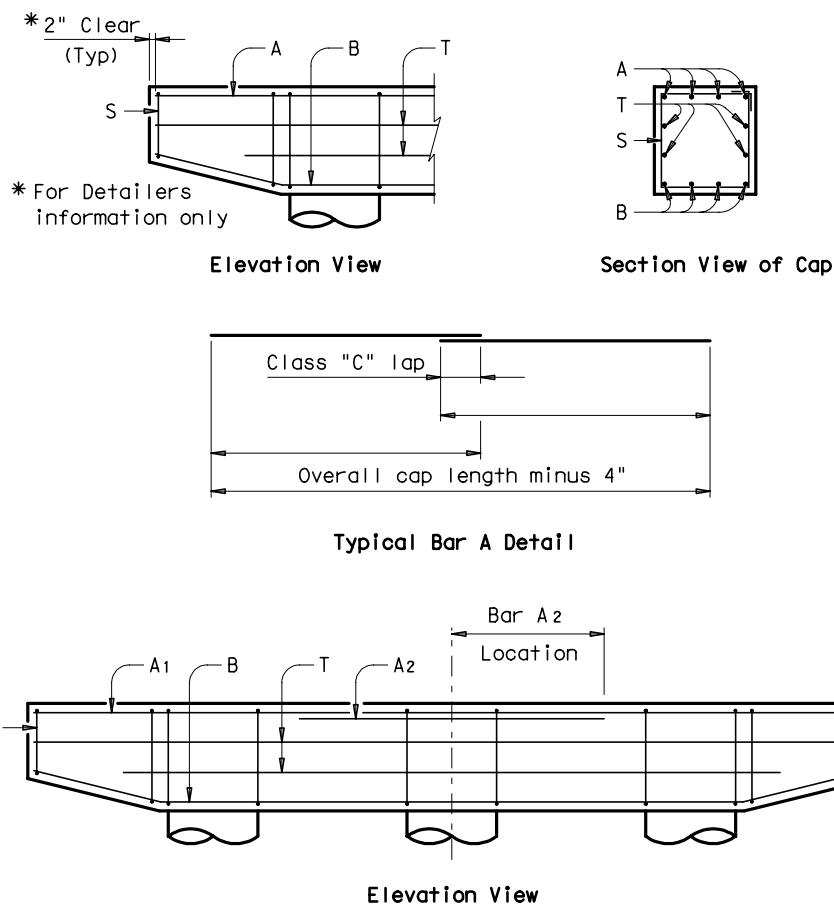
Bars A Details. Online users can click 4-16 to view this illustration in PDF.
